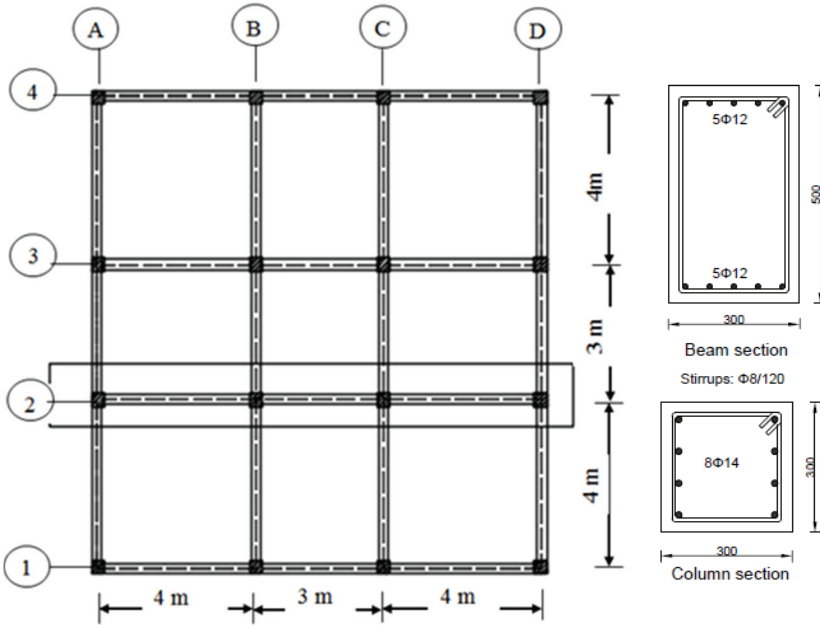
Structural plan and column and beam reinforcing, and geometric details of RC building designed in 1970's
